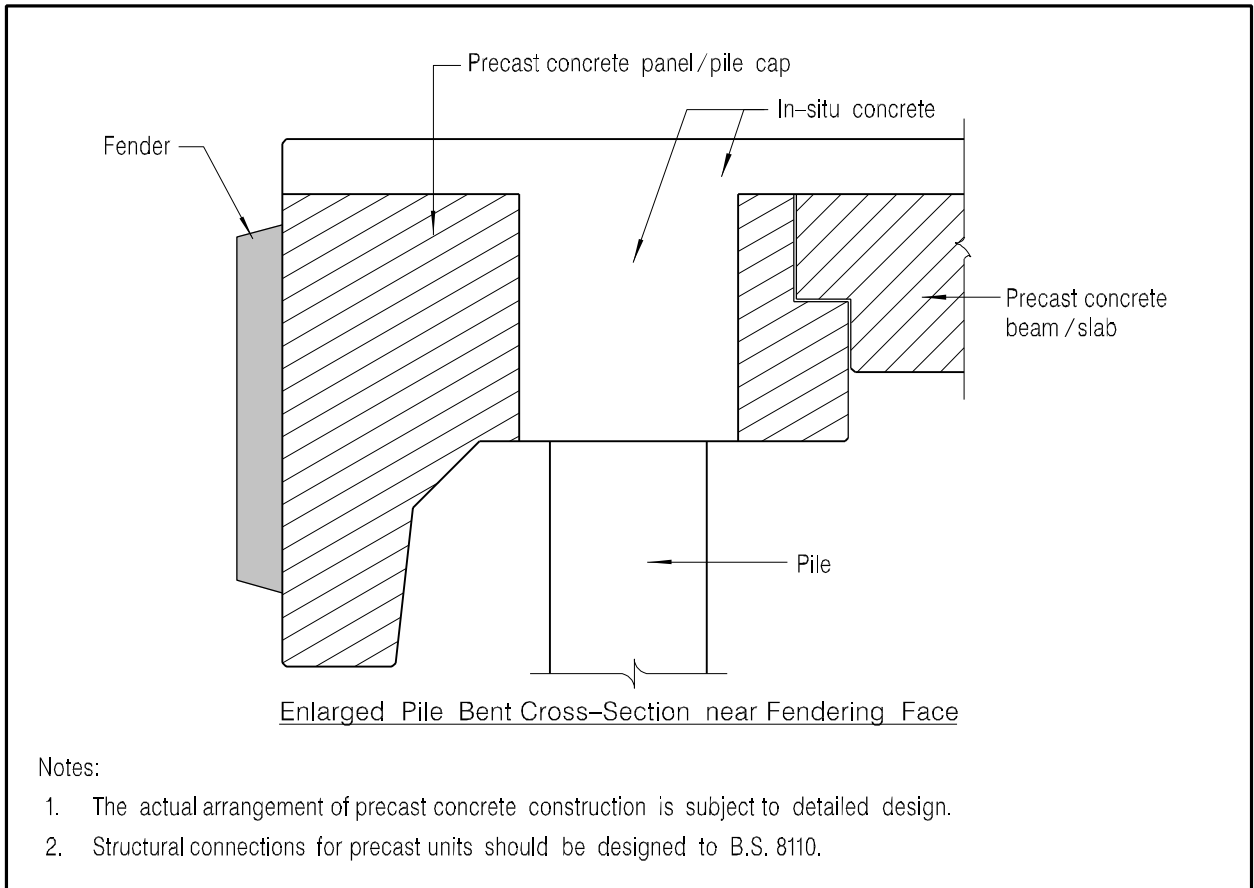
Precast Concrete Construction for Piled Deck Pier
